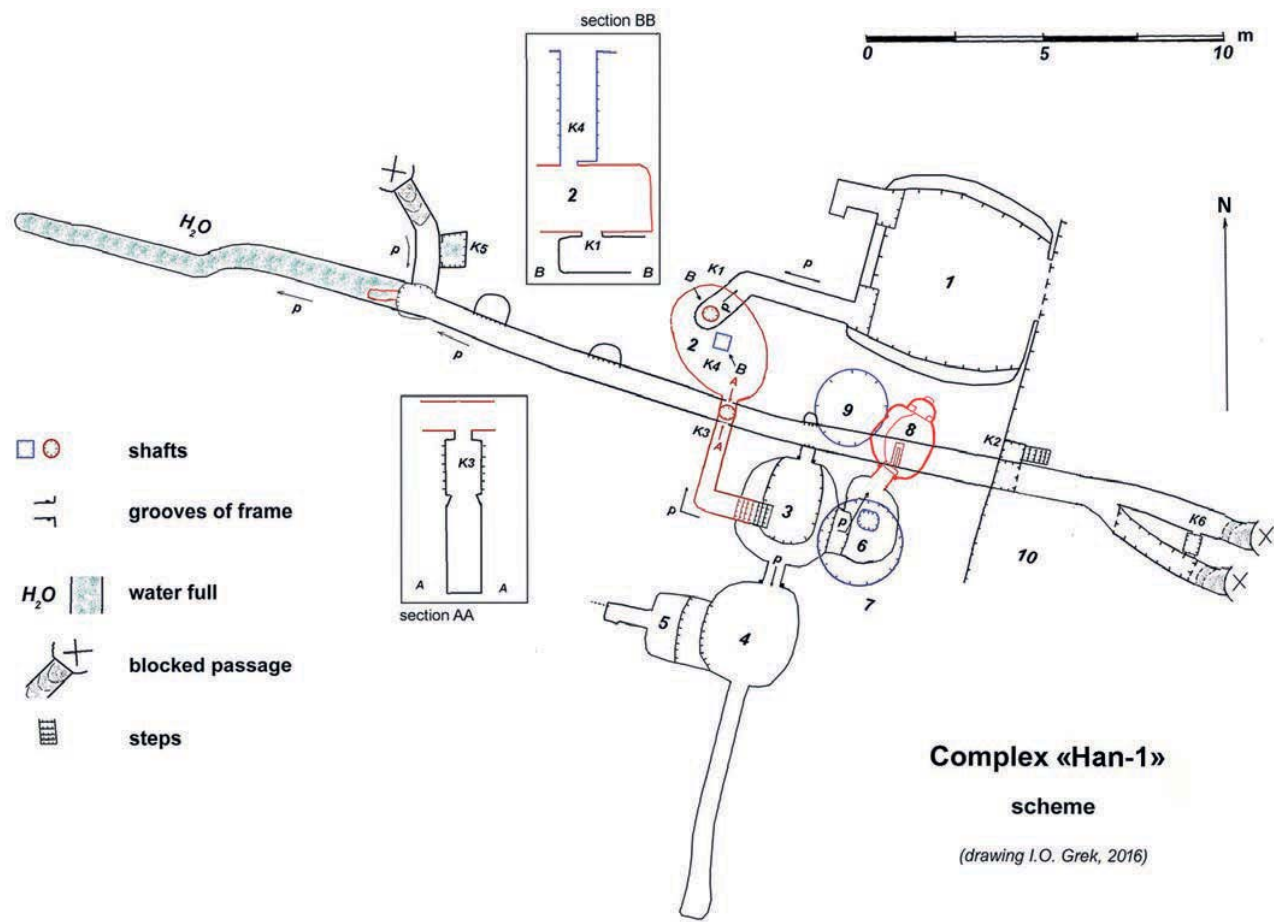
Plan (scheme) of complex Han-1 (drawing I. O. Grek).
